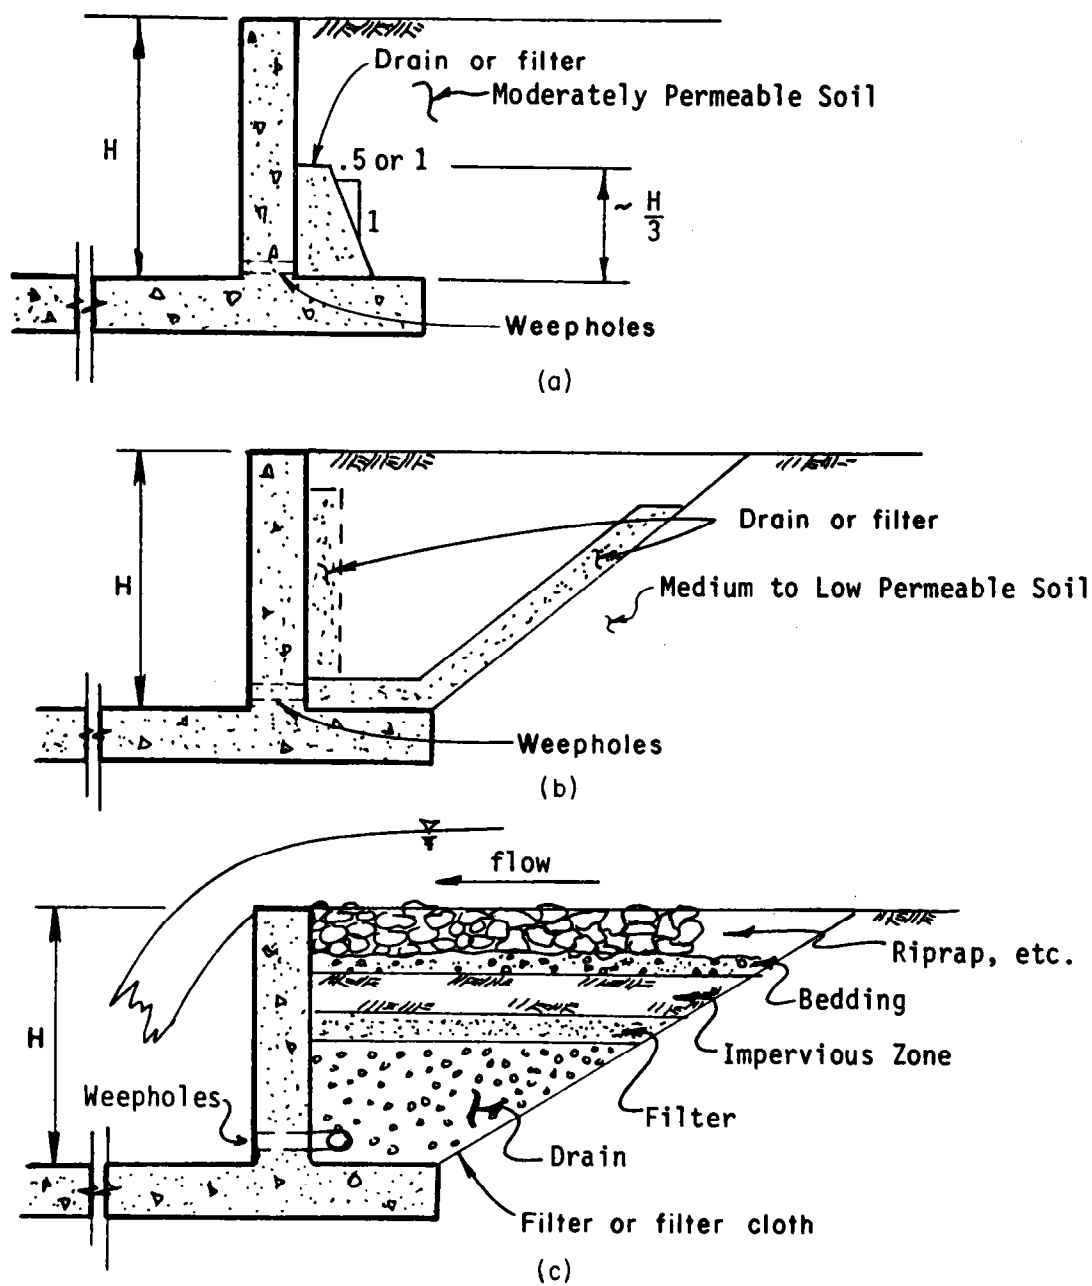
METHODS OF DRAINING BACKFILLS
